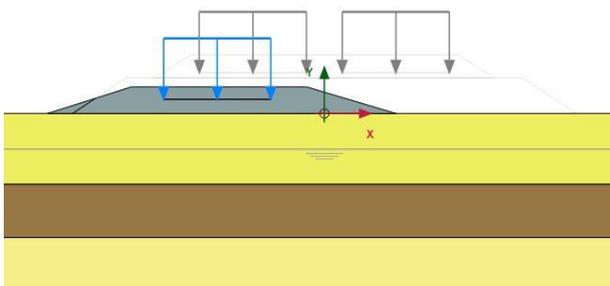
FEM model for A section without soil improvement: the first phase, existed rail embankment.
